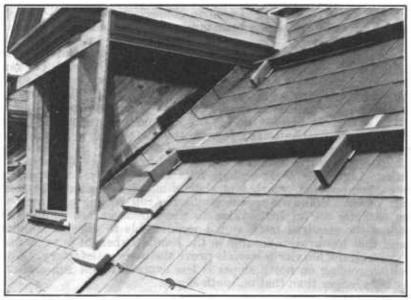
A roof covered with side-lap asbestos shingles. The metal strips holding the scaffold should be clipped off even with the edge of the shingle when the roofing has been completed. Note the snow guards protruding between the shingles near the hottom.
